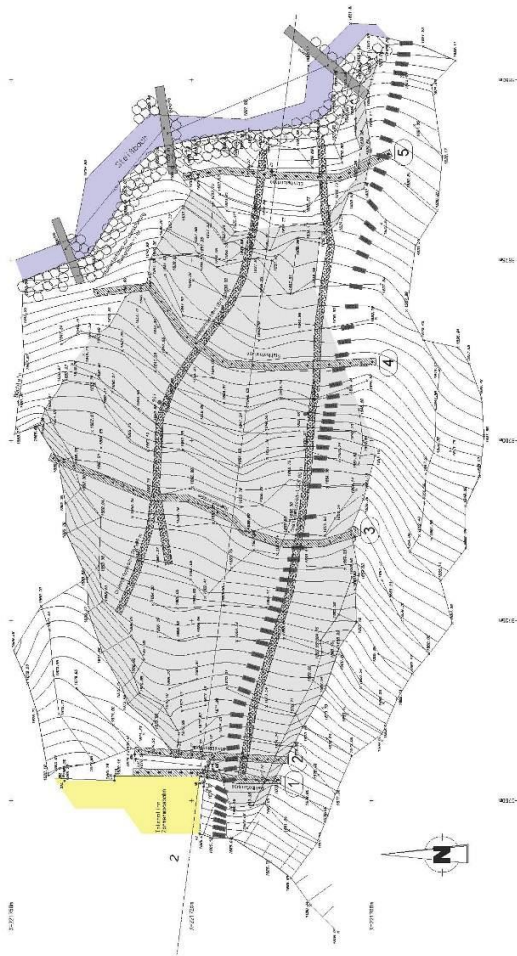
top view of site – 5 MP-walls, drainage and gulley
